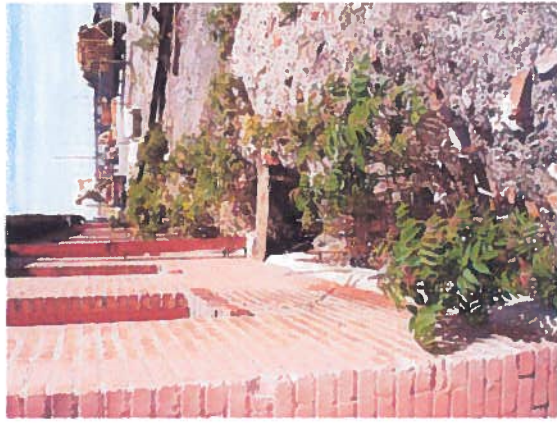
The southeast corner of the brick outbuilding shown in Figure 7 looking north. An existing roof drain leader appears to discharge underground into the soils immediately adjacent to the structure. This may have contributed to the damage observed in Figure 7.
